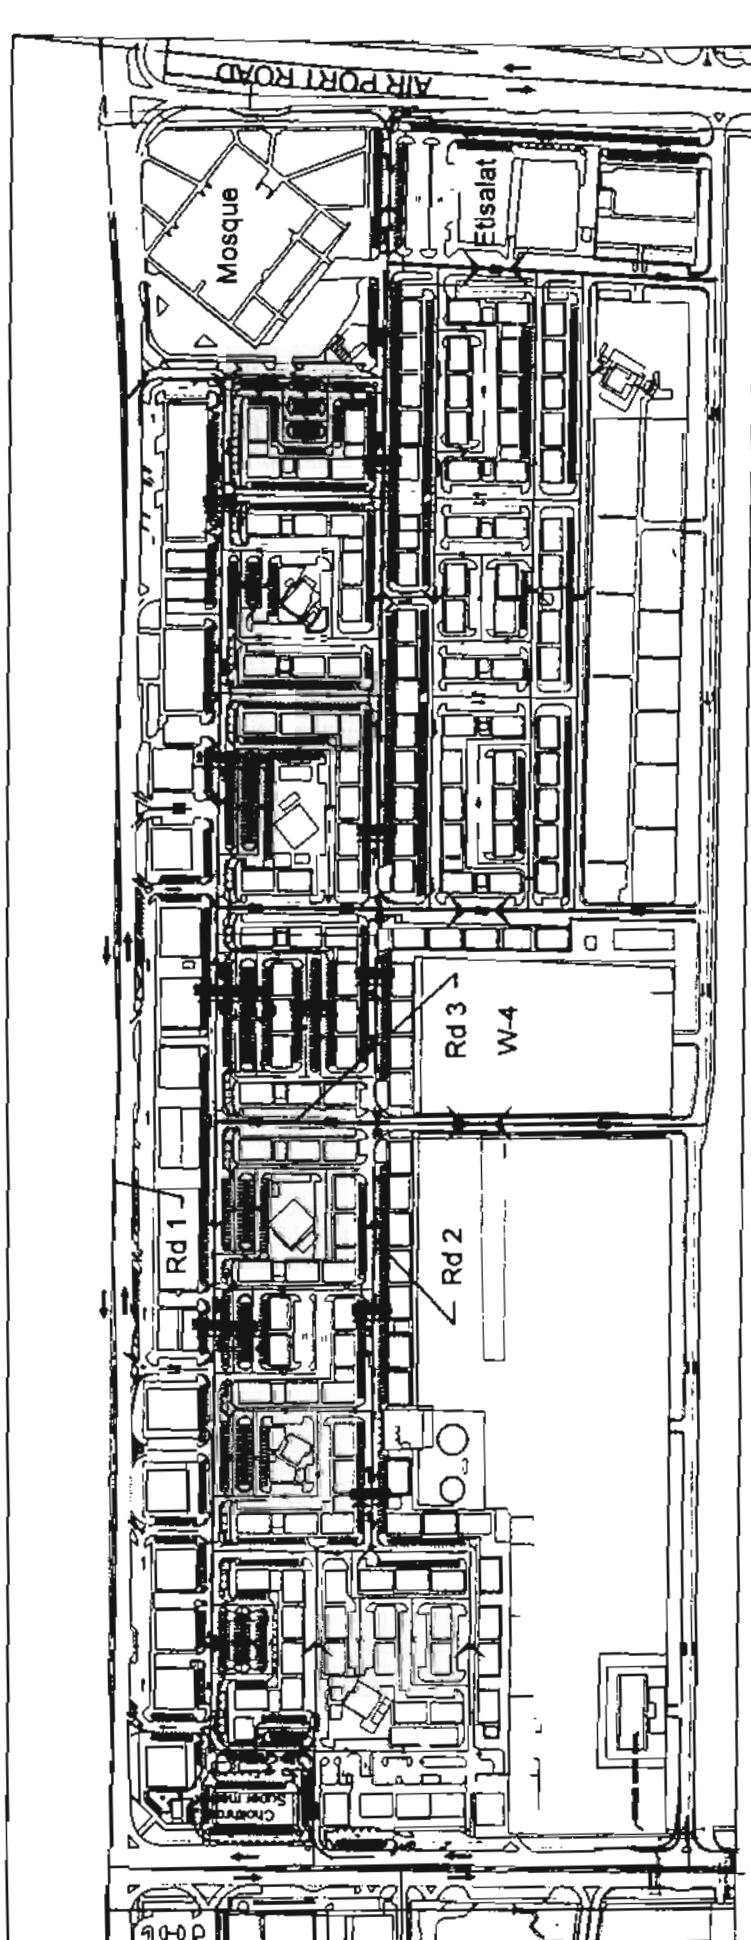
Proposed Traffic & Parking Configuration Plan For Sector w-4 (before situation)
